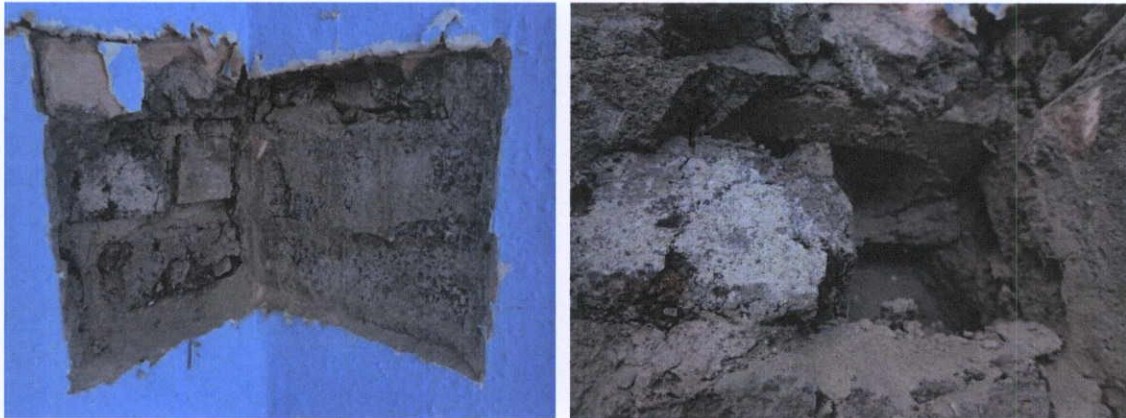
Inner face of the façade wall at the stairwell showing concrete blockwork, with repairs to the party wall.
